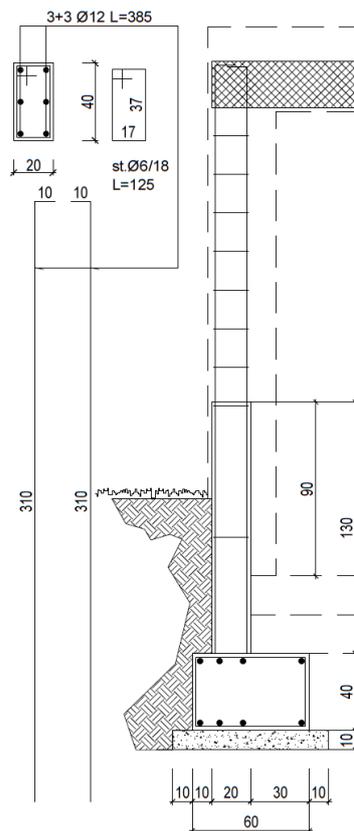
Column reinforcement (EXECUTIVE PROJECT)
